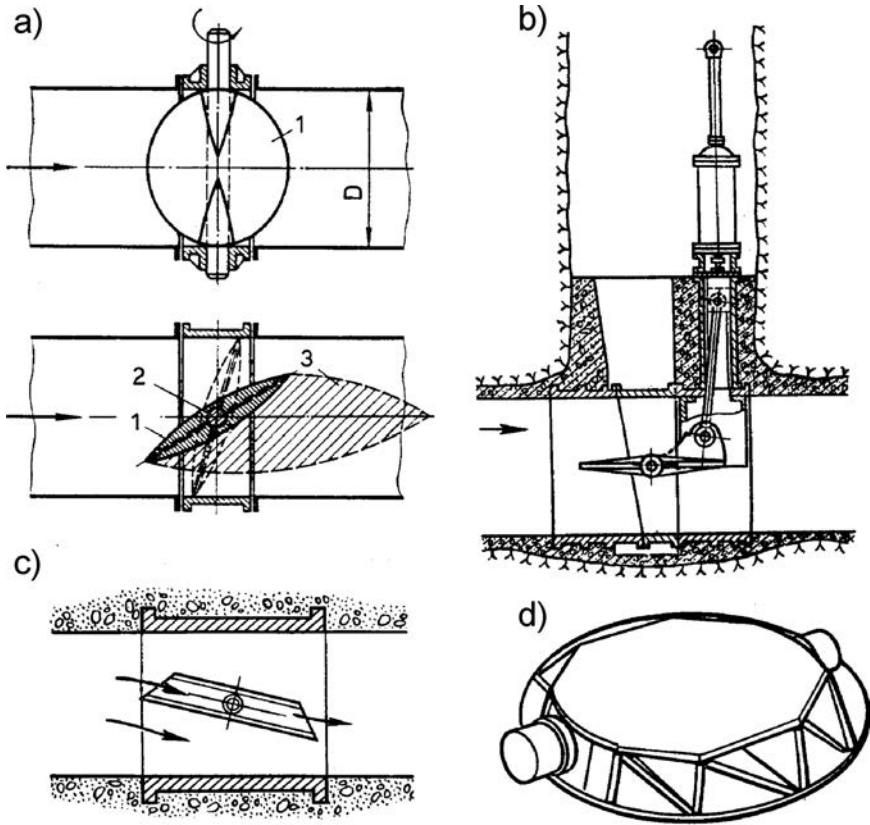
Disc-like or butterfly valves (after Grishin et al., 1979). (a) Scheme of a valve in the form of a lens (layout and section); (b) valve control with hydraulic mechanism; (c) flat disc-like valve; (d) structure of a flat disc. (1) Disc; (2) axis; (3) whirlpool zone.
